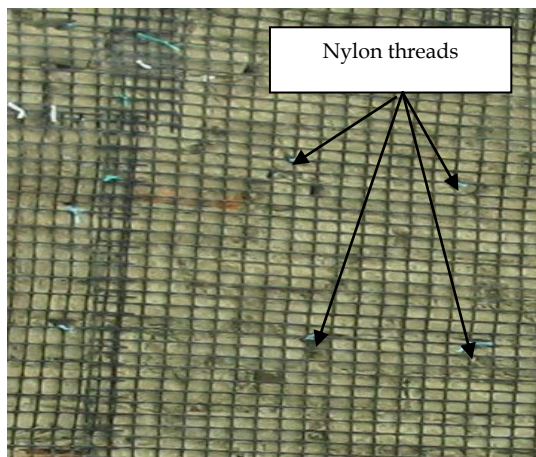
The application of polymer grids to an adobe wall (Source: Torrealva, 2008)
